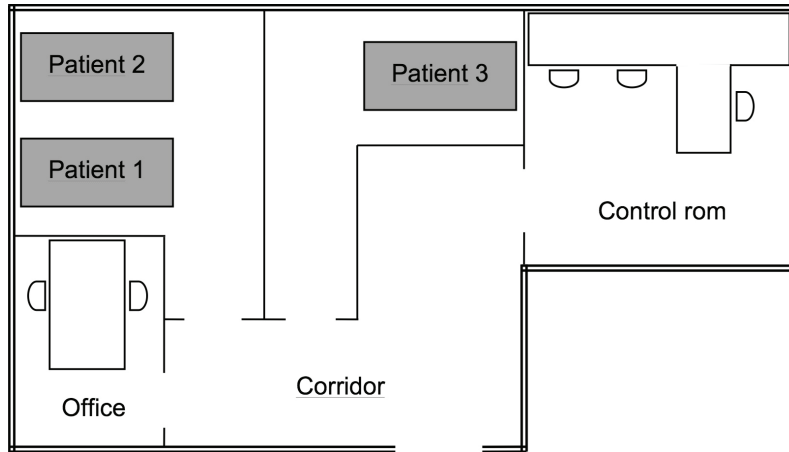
Floor plan of the usability laboratory used in the studies (adapted from Bjønnes, 2007).
